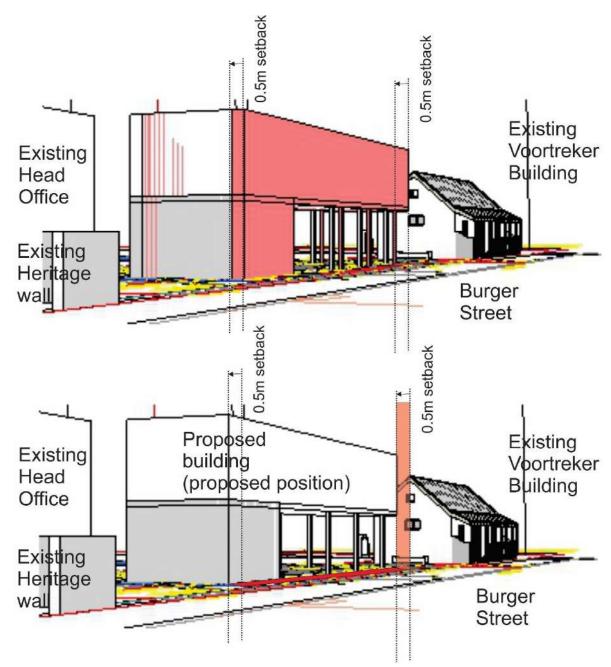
Proposed revit 3d perpective setback proposal (0.5m setback impact)
